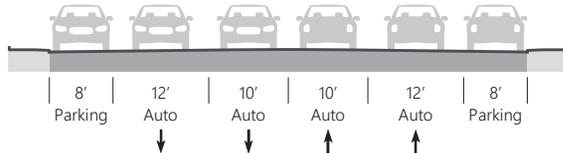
EXISTING CROSS-SECTION MILES AVENUE
